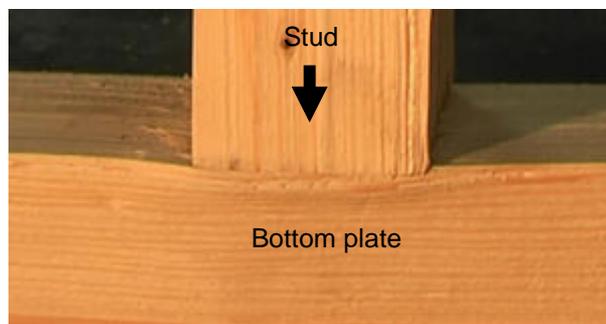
Illustration of perpendicular to grain crushing of bottom plate due to stud
